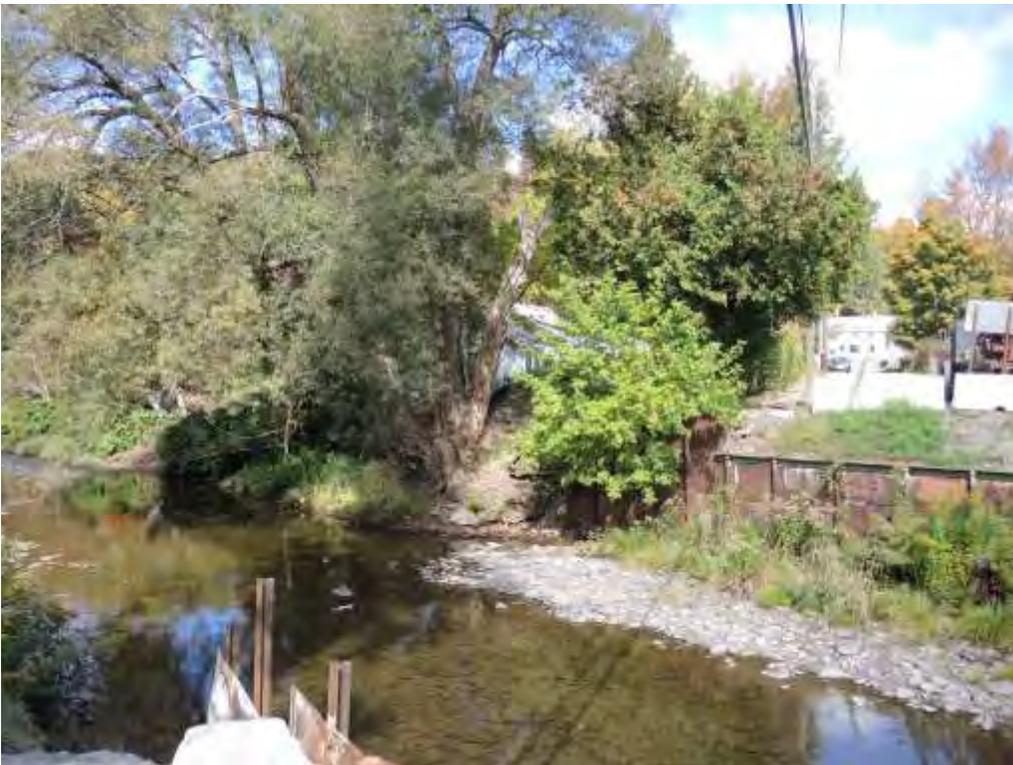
Project site, view southeast looking upstream from south side of Bushkill.
